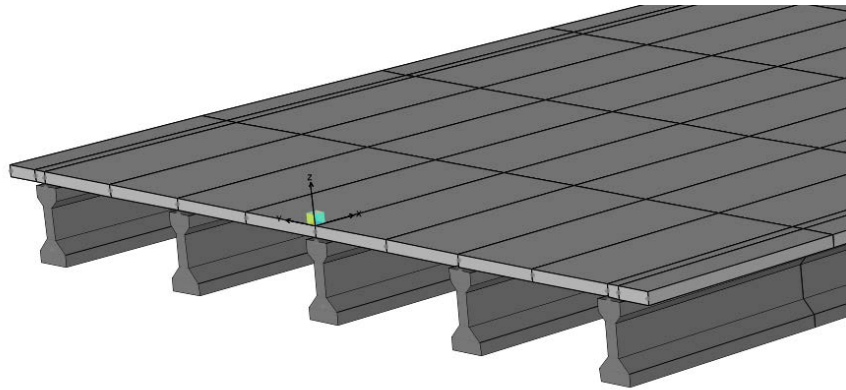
Extruded View of Highway Bridge Superstructure in CSIBRIDGE
